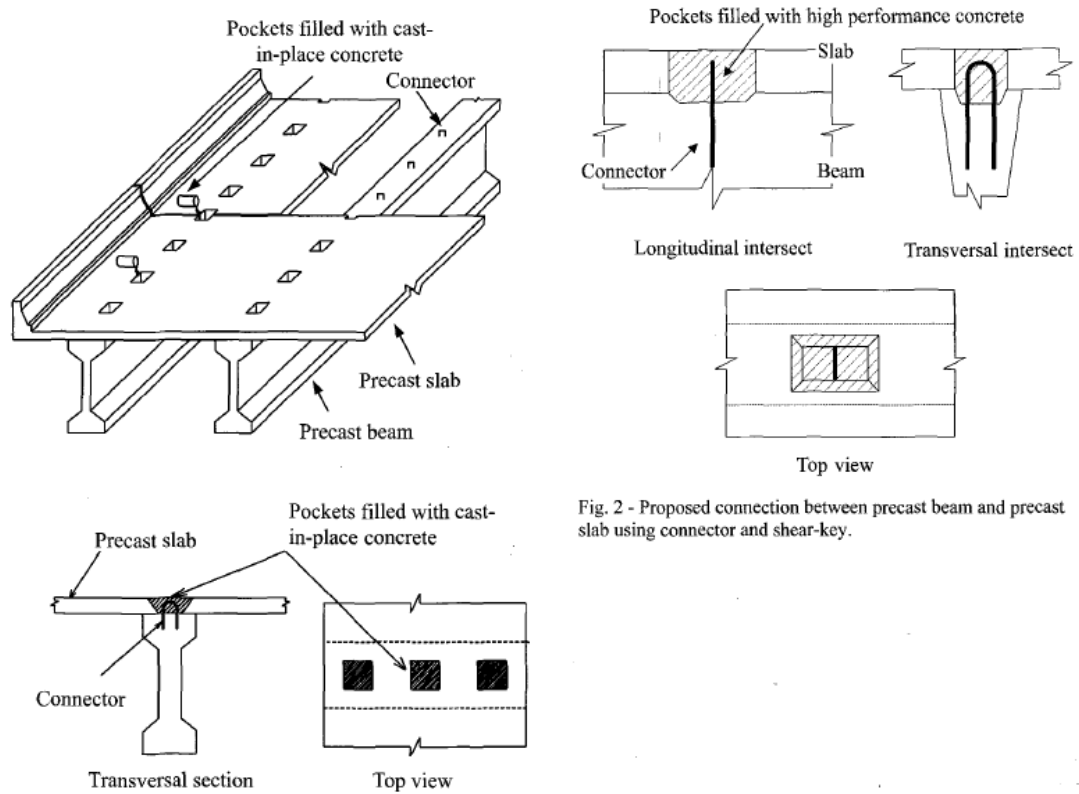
Proposed connection between precast beam and precast slab using connector and shear-key.
